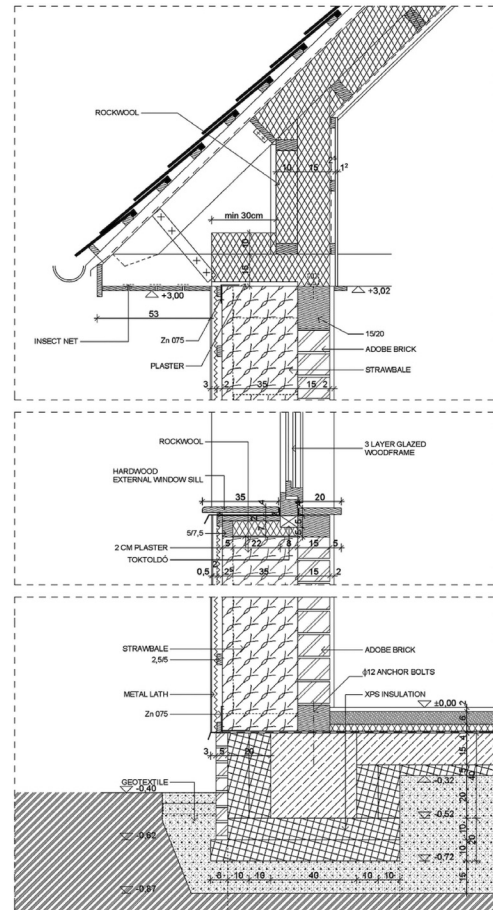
Cross section of external wall, showing the details of foundation, window and roof (authors).
